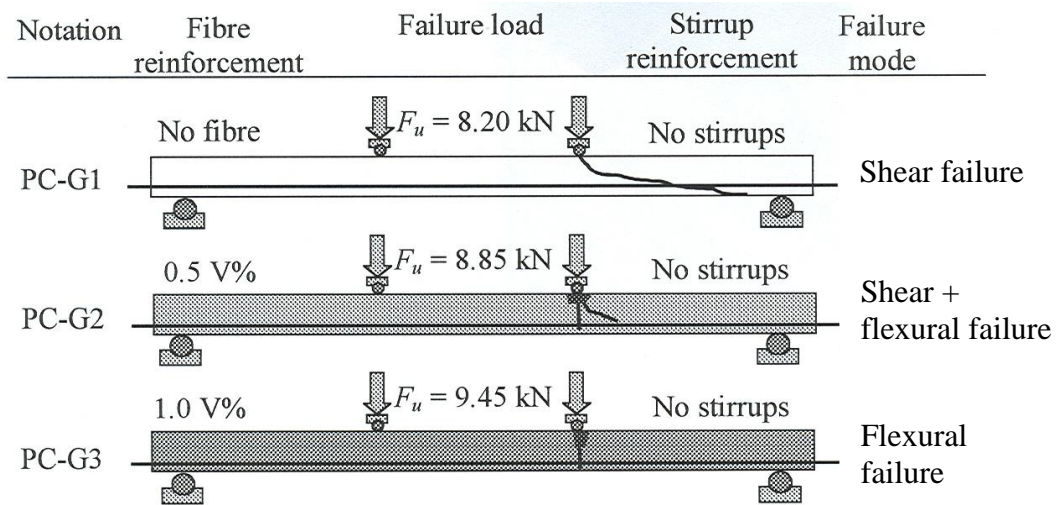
Failure loads and failure patterns of prestressed pretensioned beams with different steel fibre contents (Balázs, Kovács, 2005)
